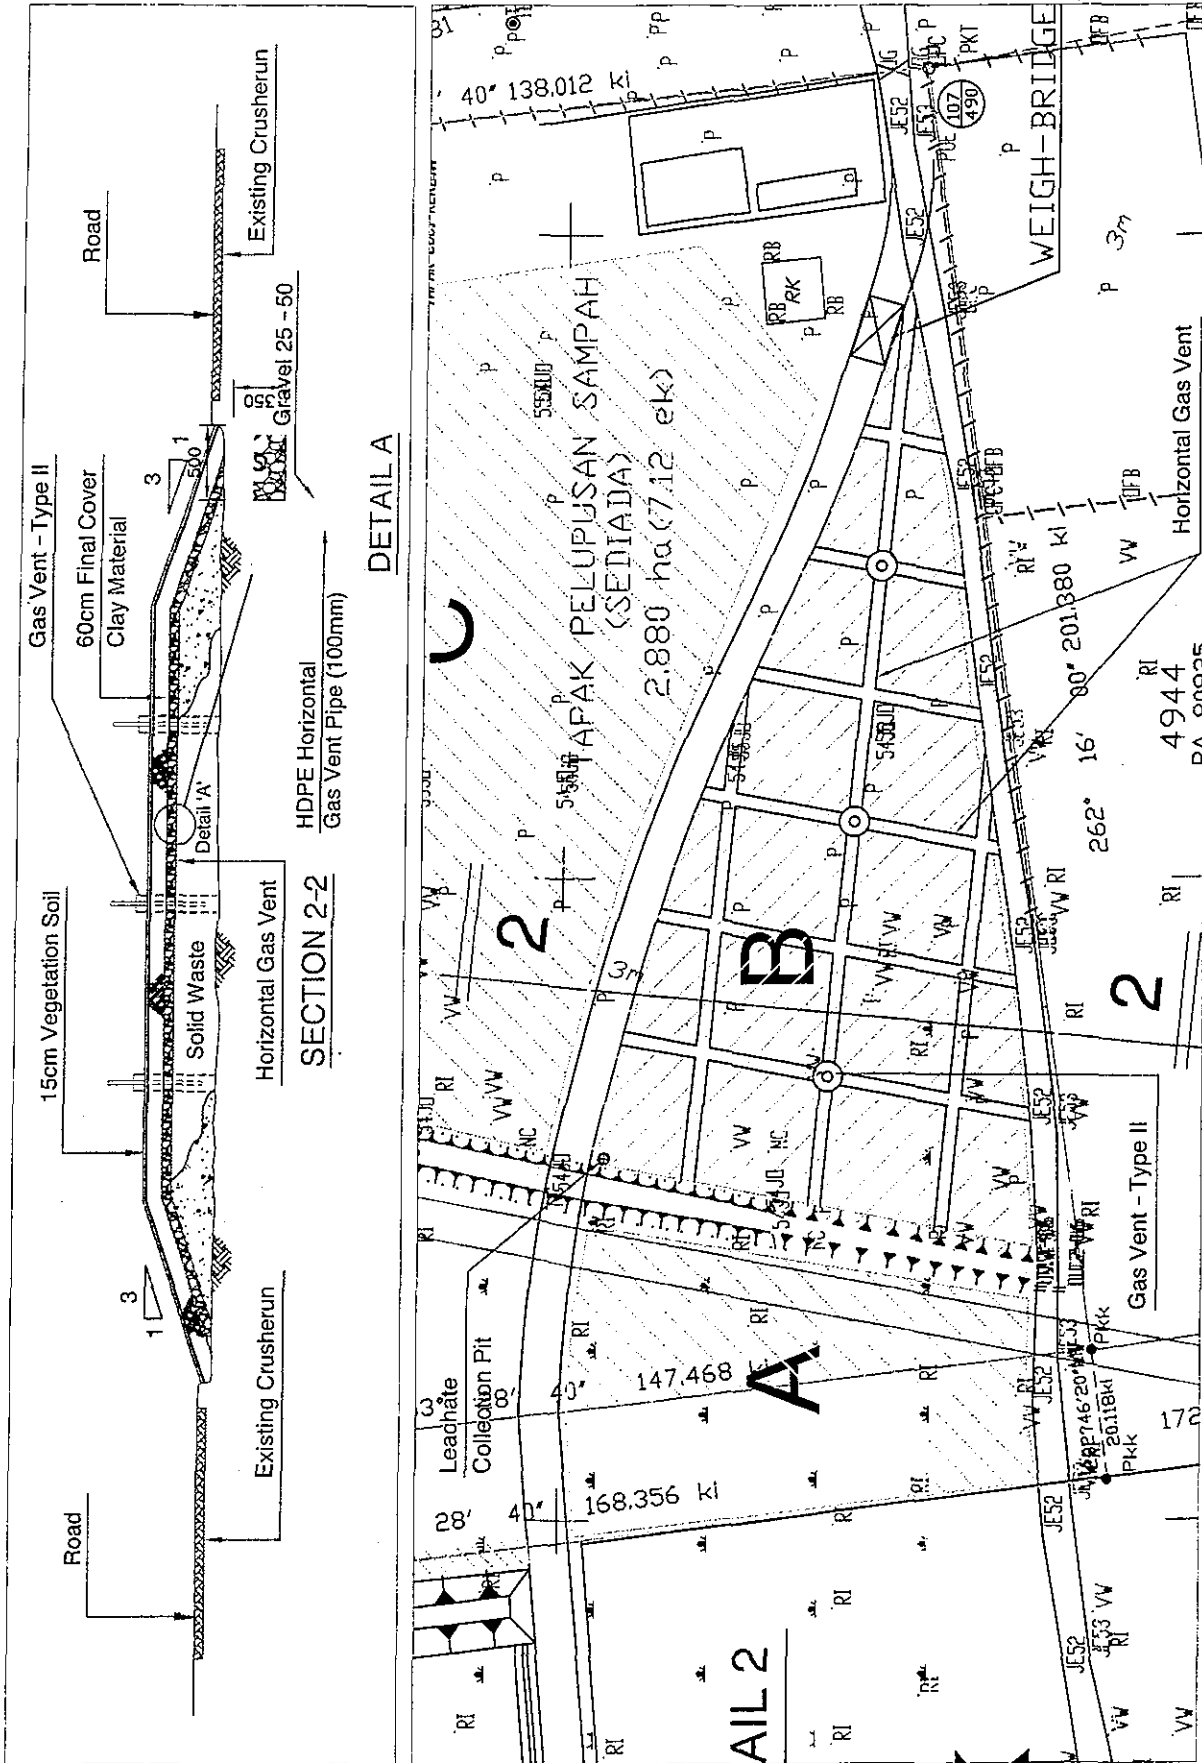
Closure Plan of Block B - Horizontal Gas Vent Layout Plan
